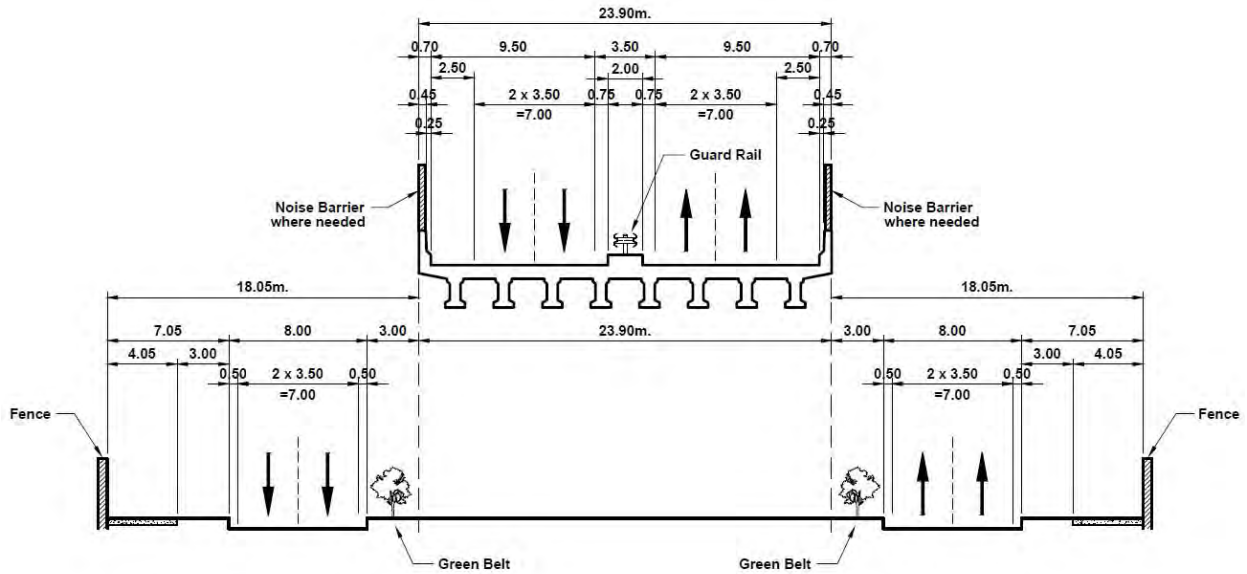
TYPICAL CROSS SECTION: FLYOVER SECTION
